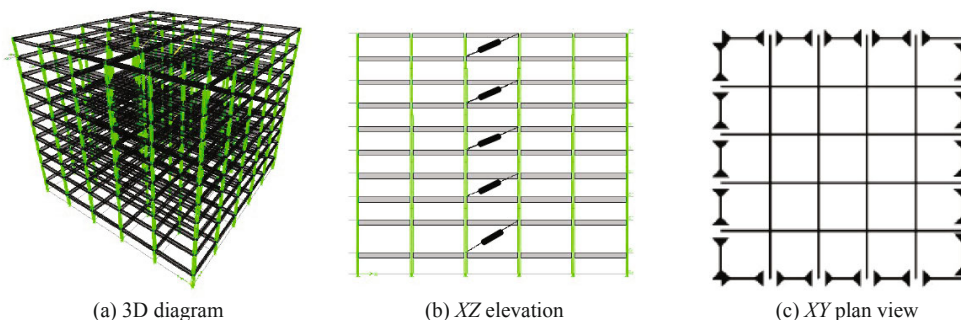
Nine-story steel structure benchmark model and dampers setting
